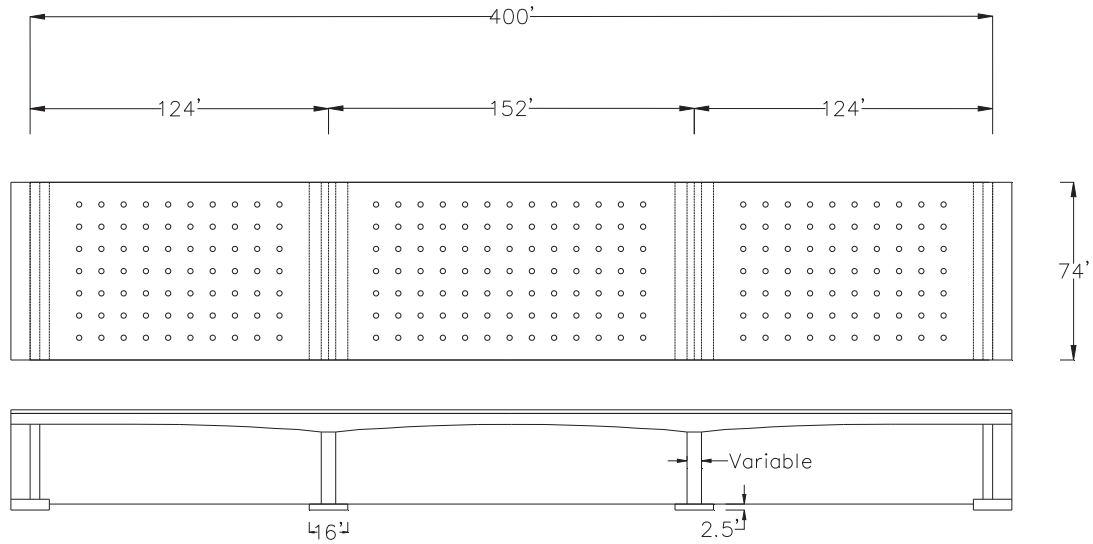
Bridge with Perforated Deck (Rolling Surface not Shown)
